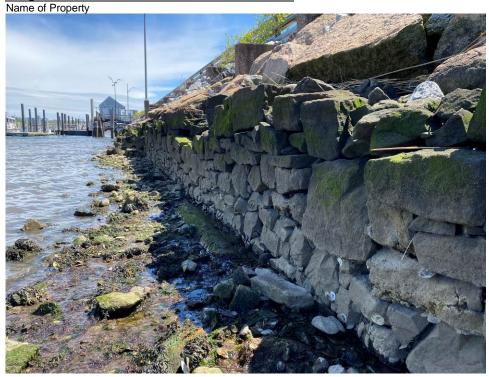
Long Wharf Pier structure, looking south (2021, New Haven Preservation Trust).
